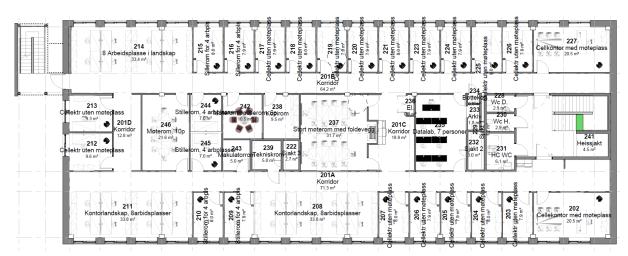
Floor plan, 2nd floor. Illustration: ABO Plan og Arkitektur.
